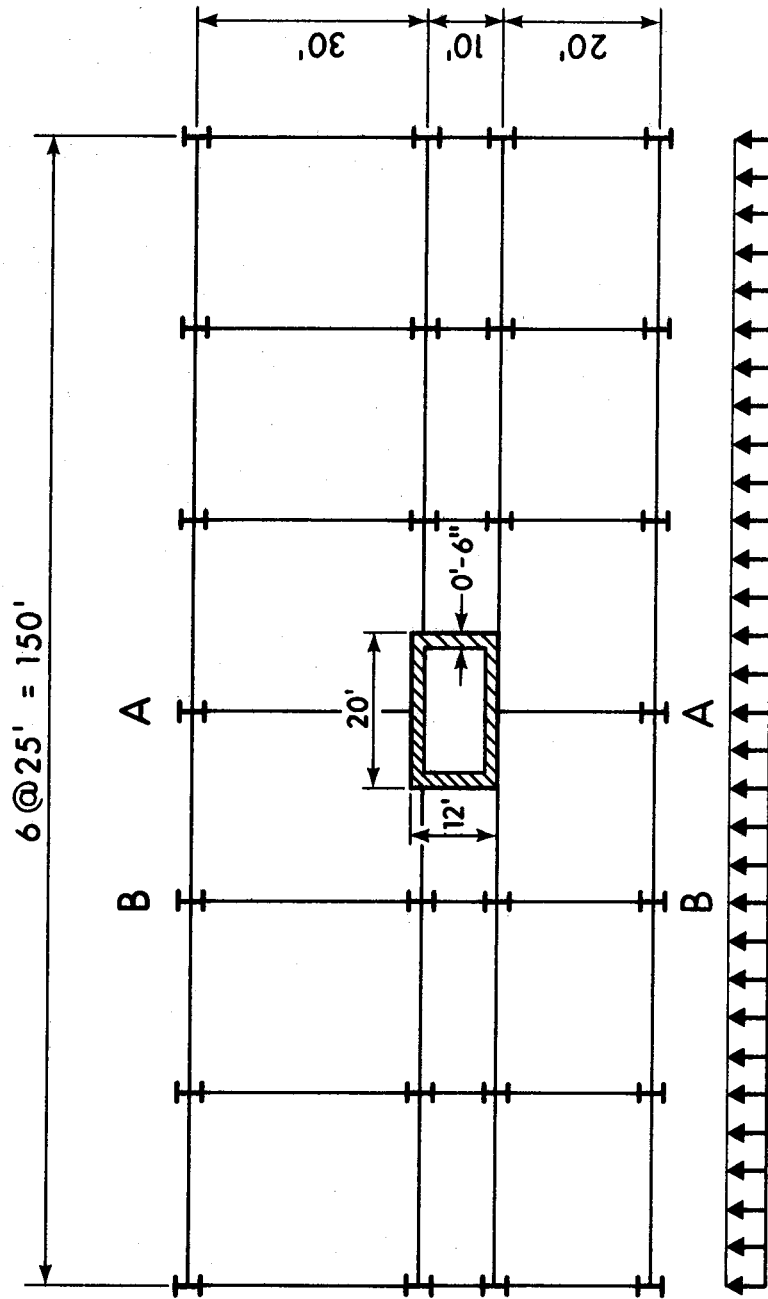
PLAN OF EXAMPLE STRUCTURES
